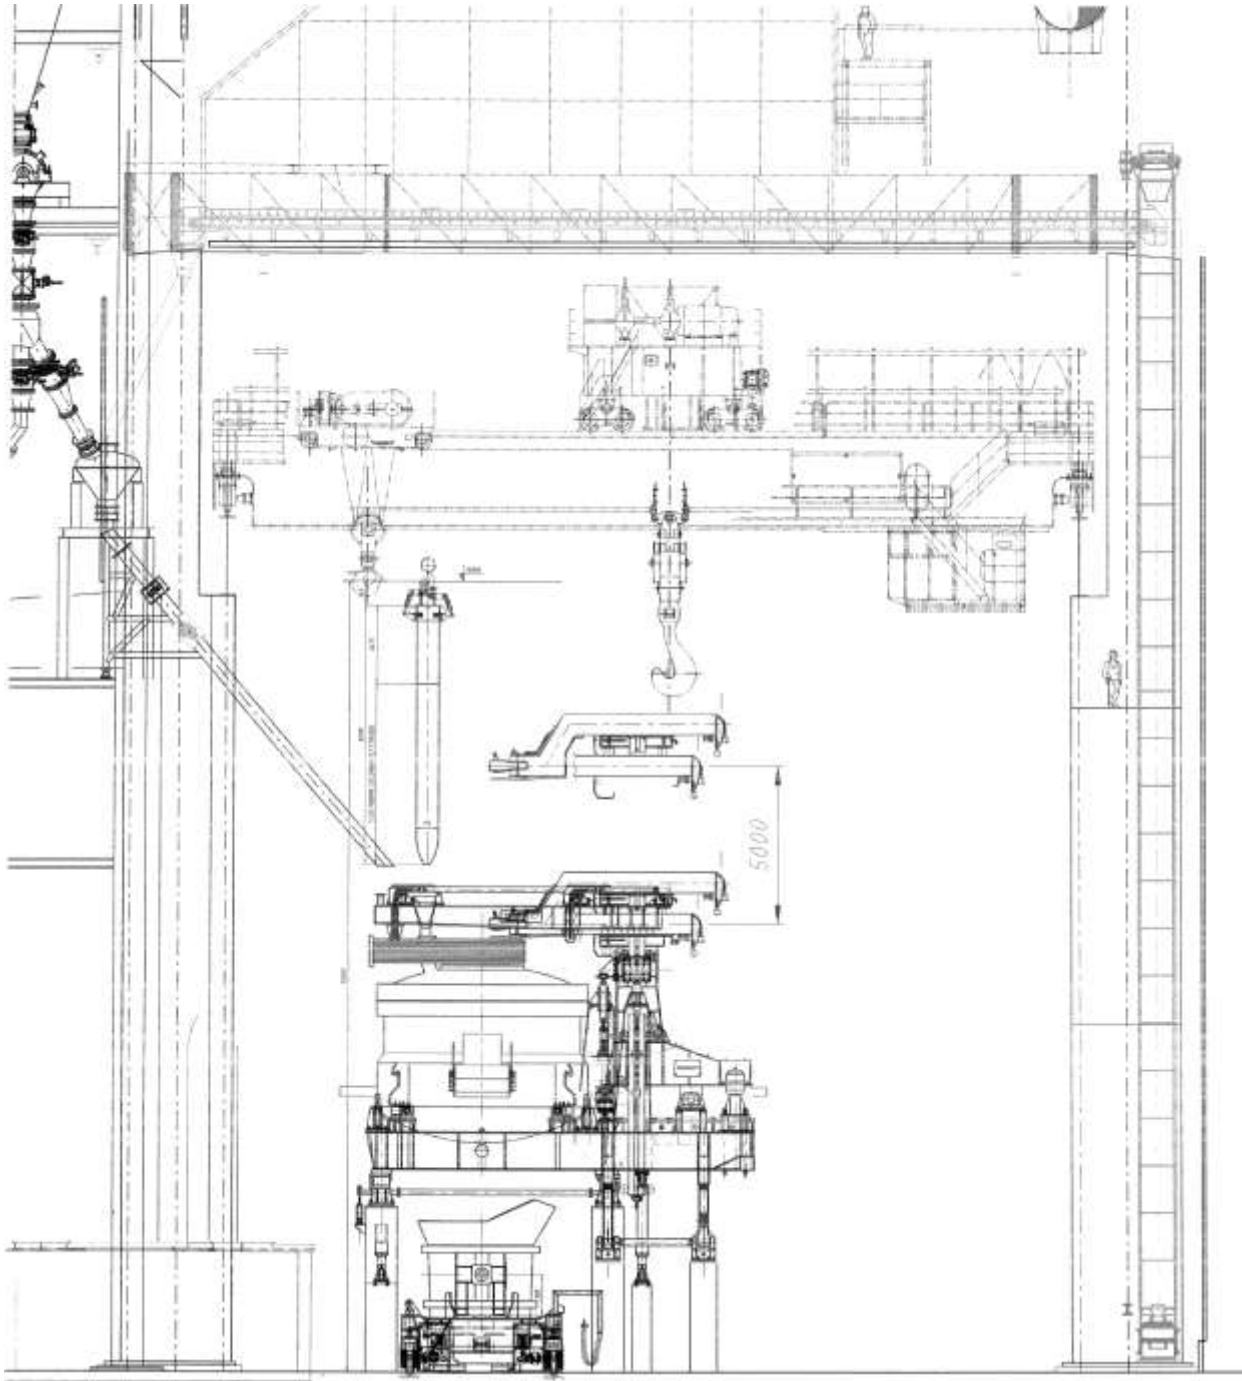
cross section of the EAF fluxes material handling system
